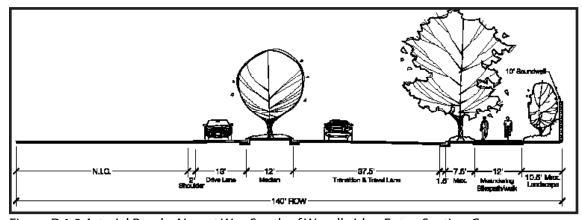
Arterial Road - Airport Way South of Woodbridge Entry, Section G
